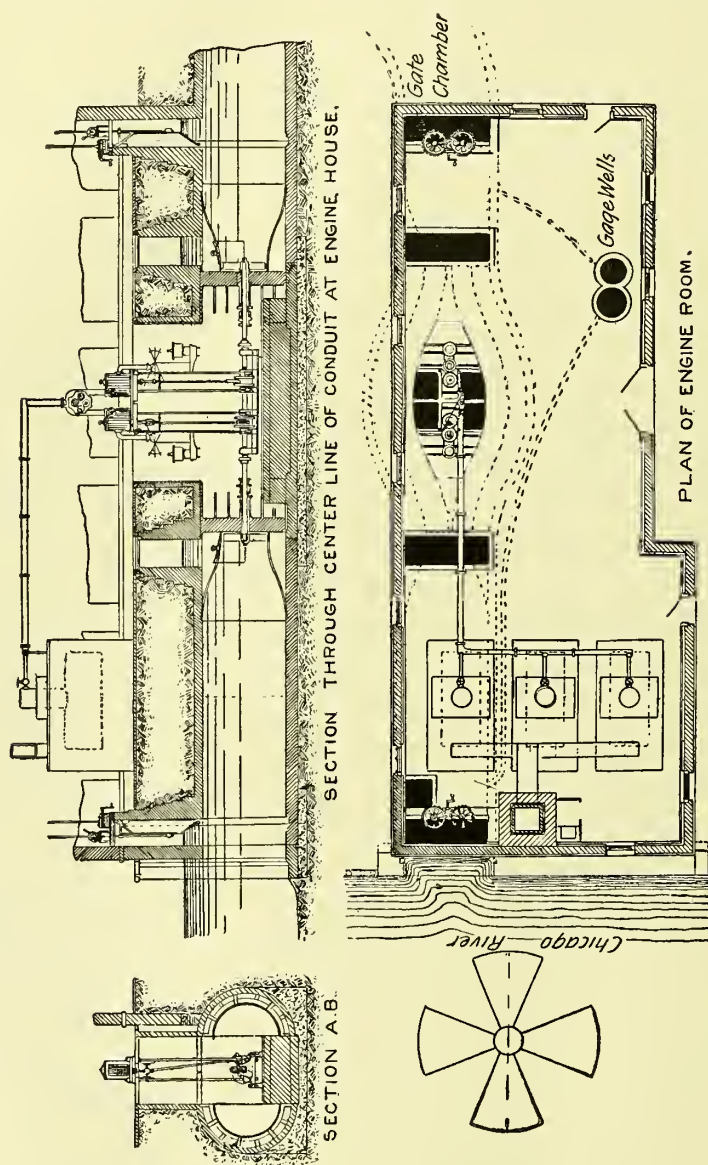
FULLERTON AVENUE CONDUIT PUMPING STATION, CHICAGO.
